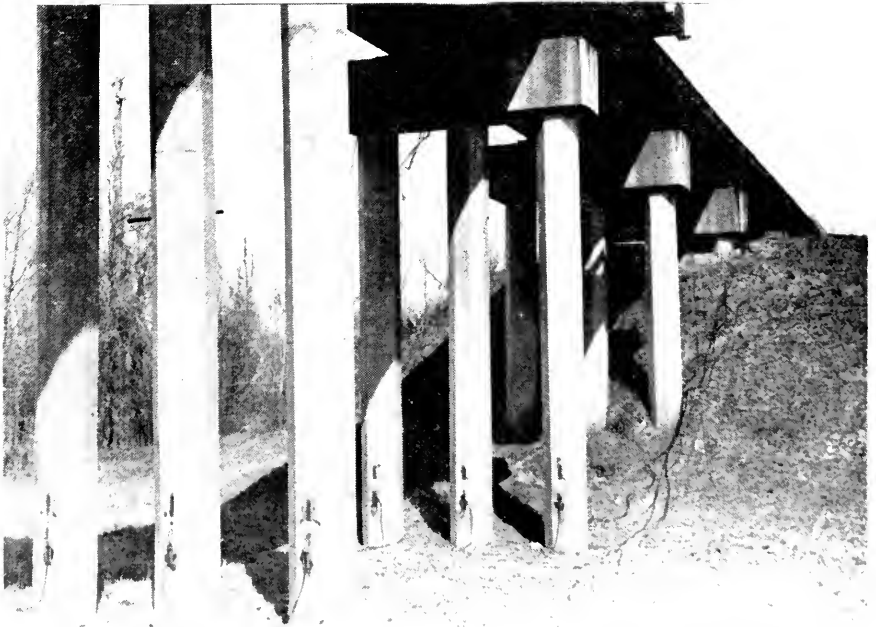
General views of reinforced concrete pile bents of north approach structure to Bridge 131, near Rochelle, La.
